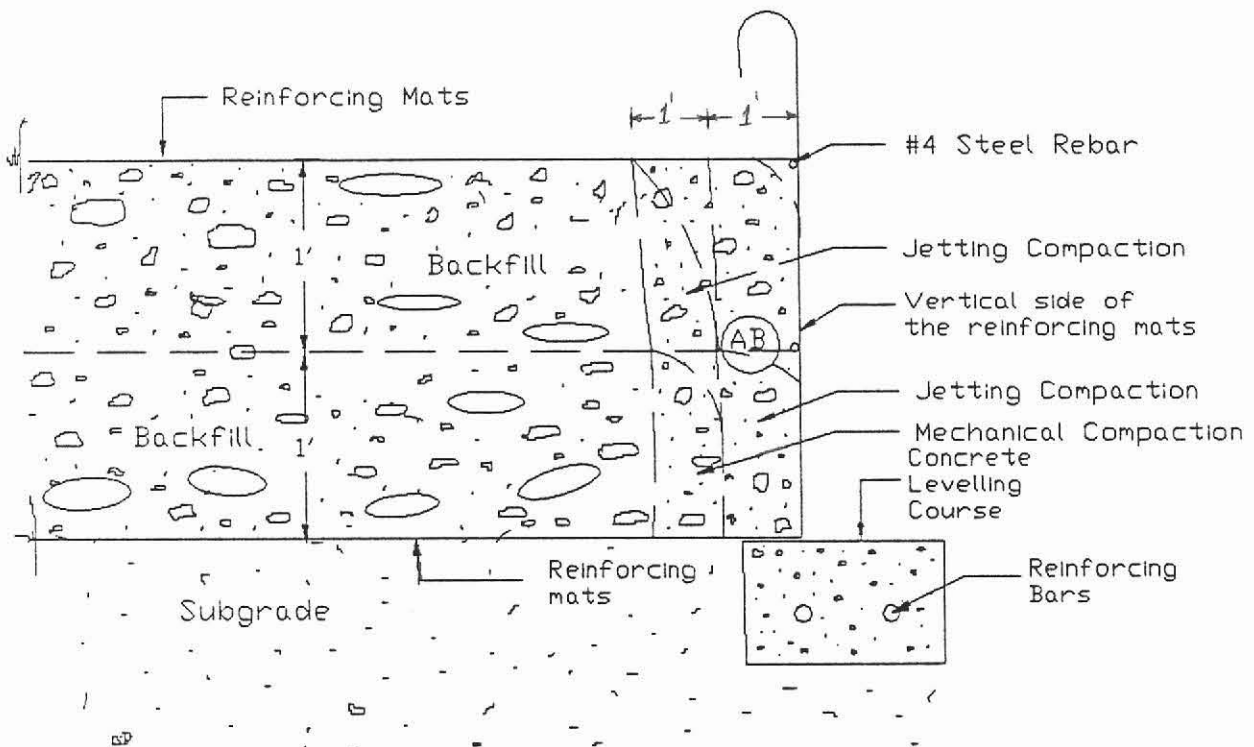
Schematic Diagram of a Typical Section of the Hilfiker Wall Constructed at the N.E. and the S.W. Walls
